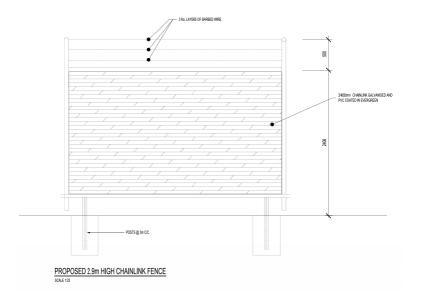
Proposed 2.9 m Outer Perimeter Fence
